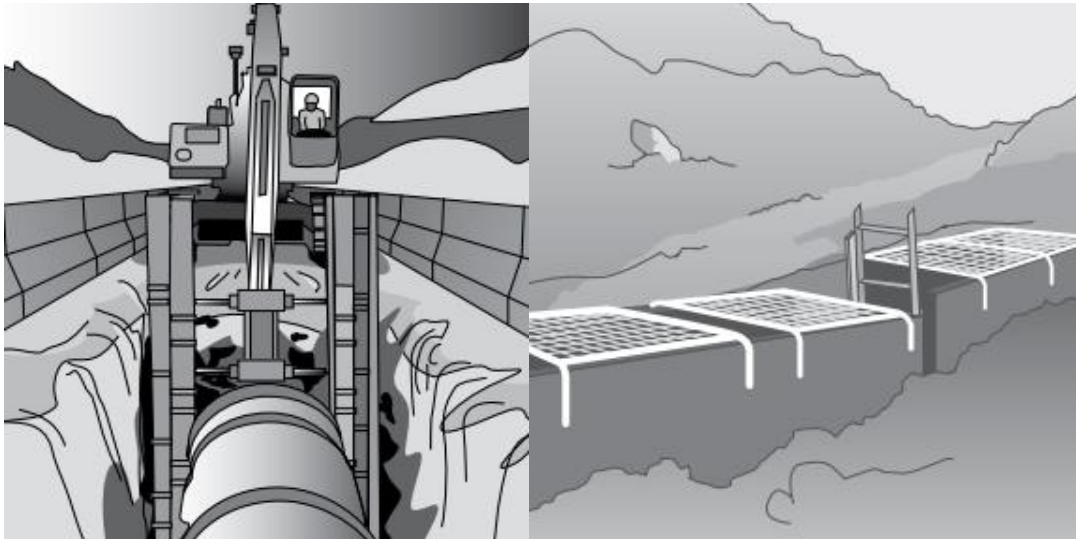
(left) Example of Extending the trench box above the excavation. (right) Steel mesh covers over the trench box (p. 22, Safe Work Australia 2012)
